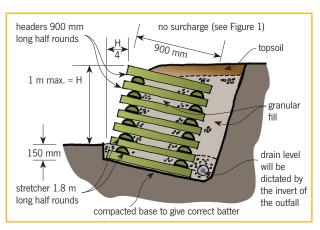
Retaining wall maximum 1 m high constructed in H5-treated half round timber.
